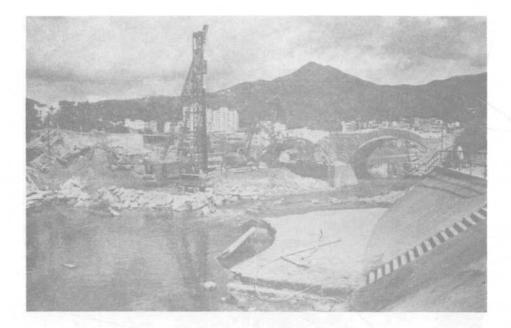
GENERAL VIEW SHOWING THE DAMAGED SHING MUN RAILWAY BRIDGE
